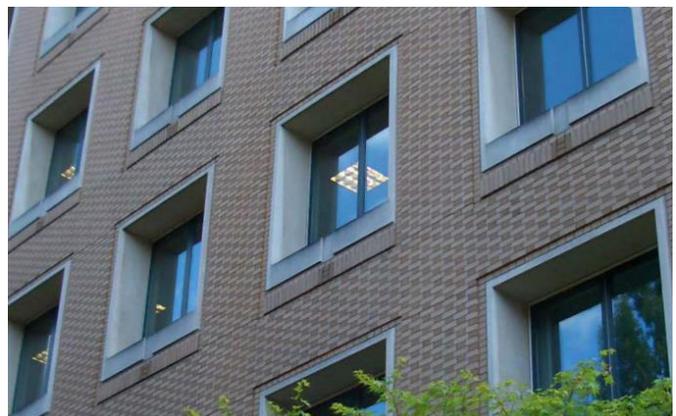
The windows in this brick wall are surrounded by both special brick courses and a continuous cast stone frame, whose depth makes the exterior wall appear thick, massive and carved.
